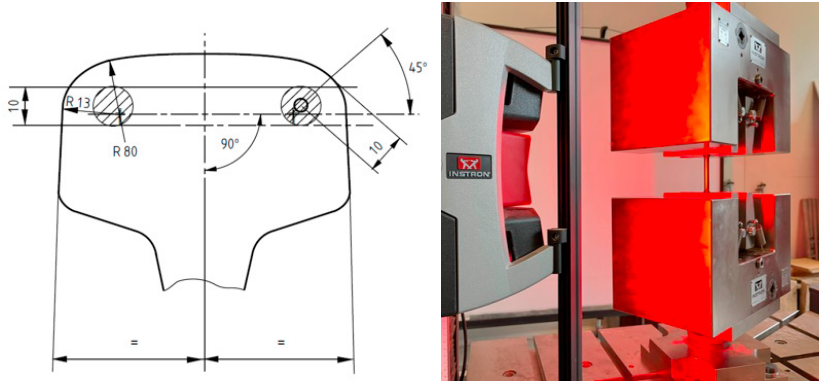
Location and dimensions (mm) of tensile specimens (left) and experimental test setup (right)
